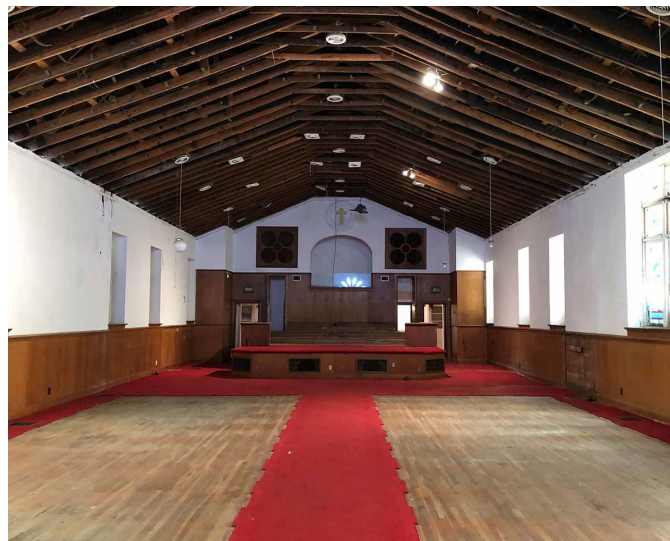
West Hunter Street Baptist Church Sanctuary With Carpet
